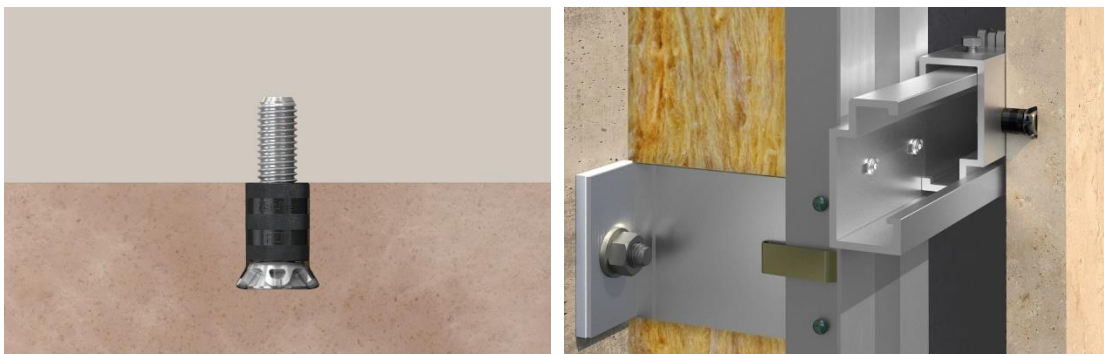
Undercut anchor mounting system - Fischer anchor [79]
